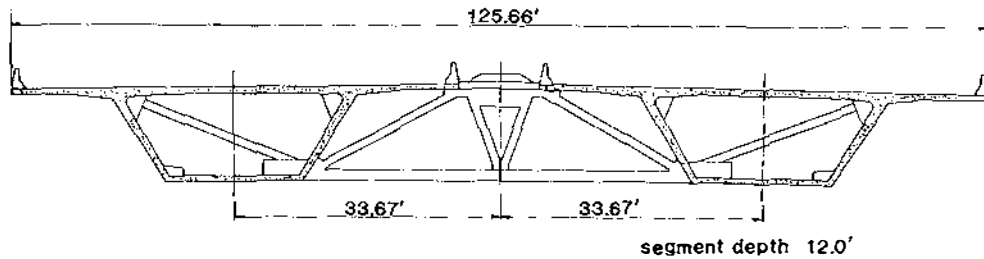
James River Bridge, cross section at stay anchorage, Cooper River Bridge similar.
